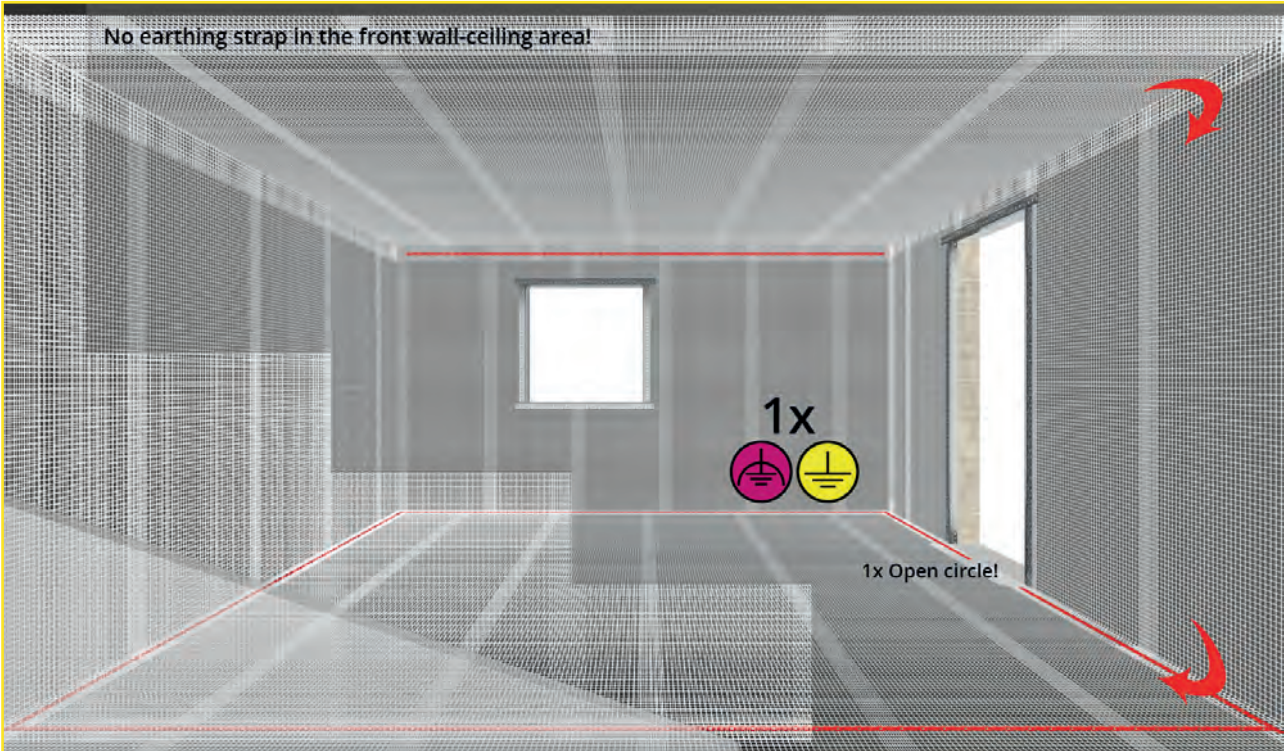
Illustration of a room shielding of all sides. Attaching the earthing strap EEB
